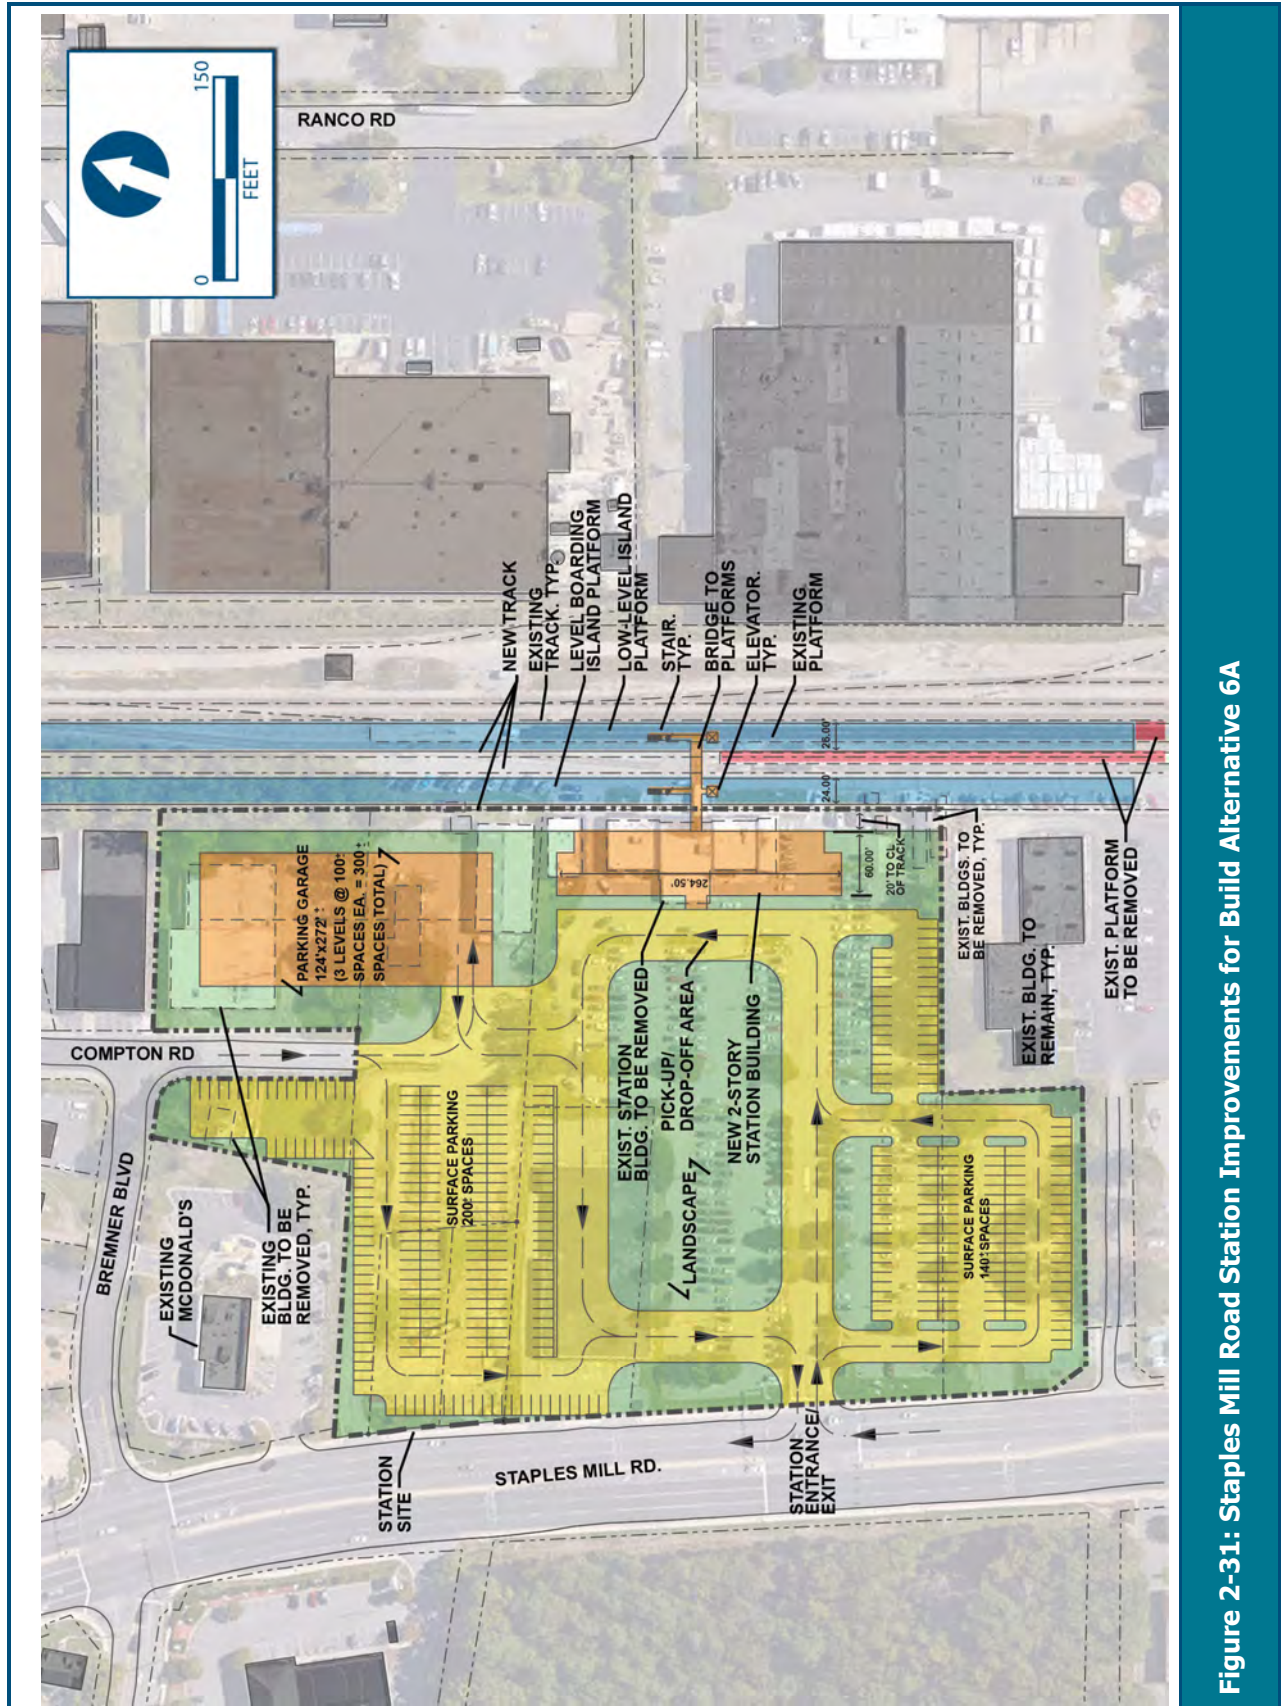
Staples Mill Road Station Improvements for Build Alternative 6A
